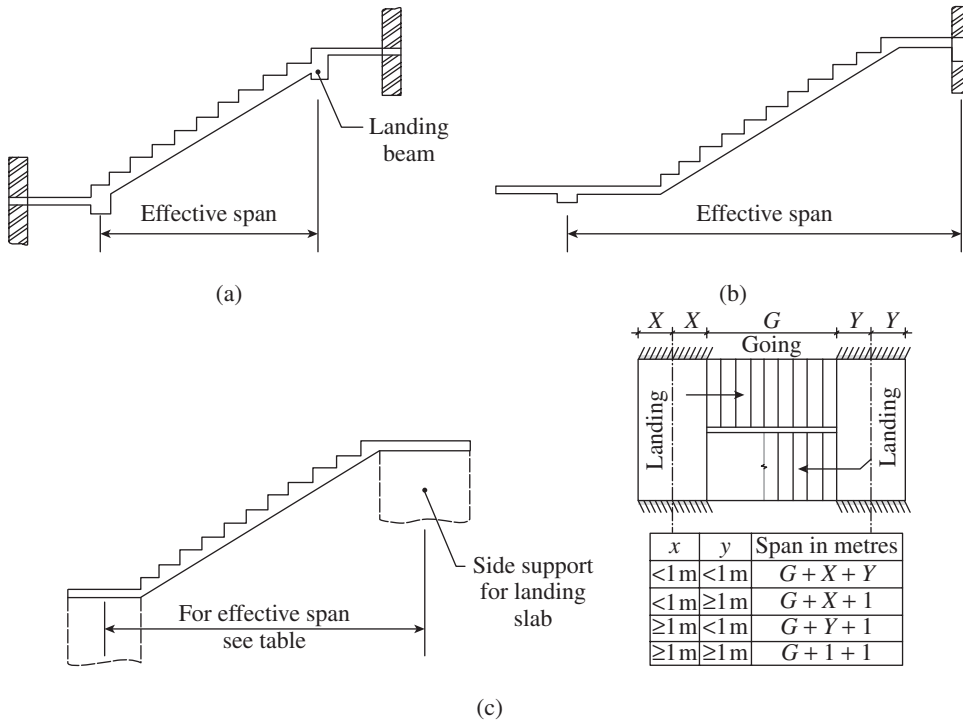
Types of stairs spanning longitudinally (a) Support at top and bottom risers (b) Landing slab spanning in the same direction as stairs (c) Supported on the edge of landing slab
